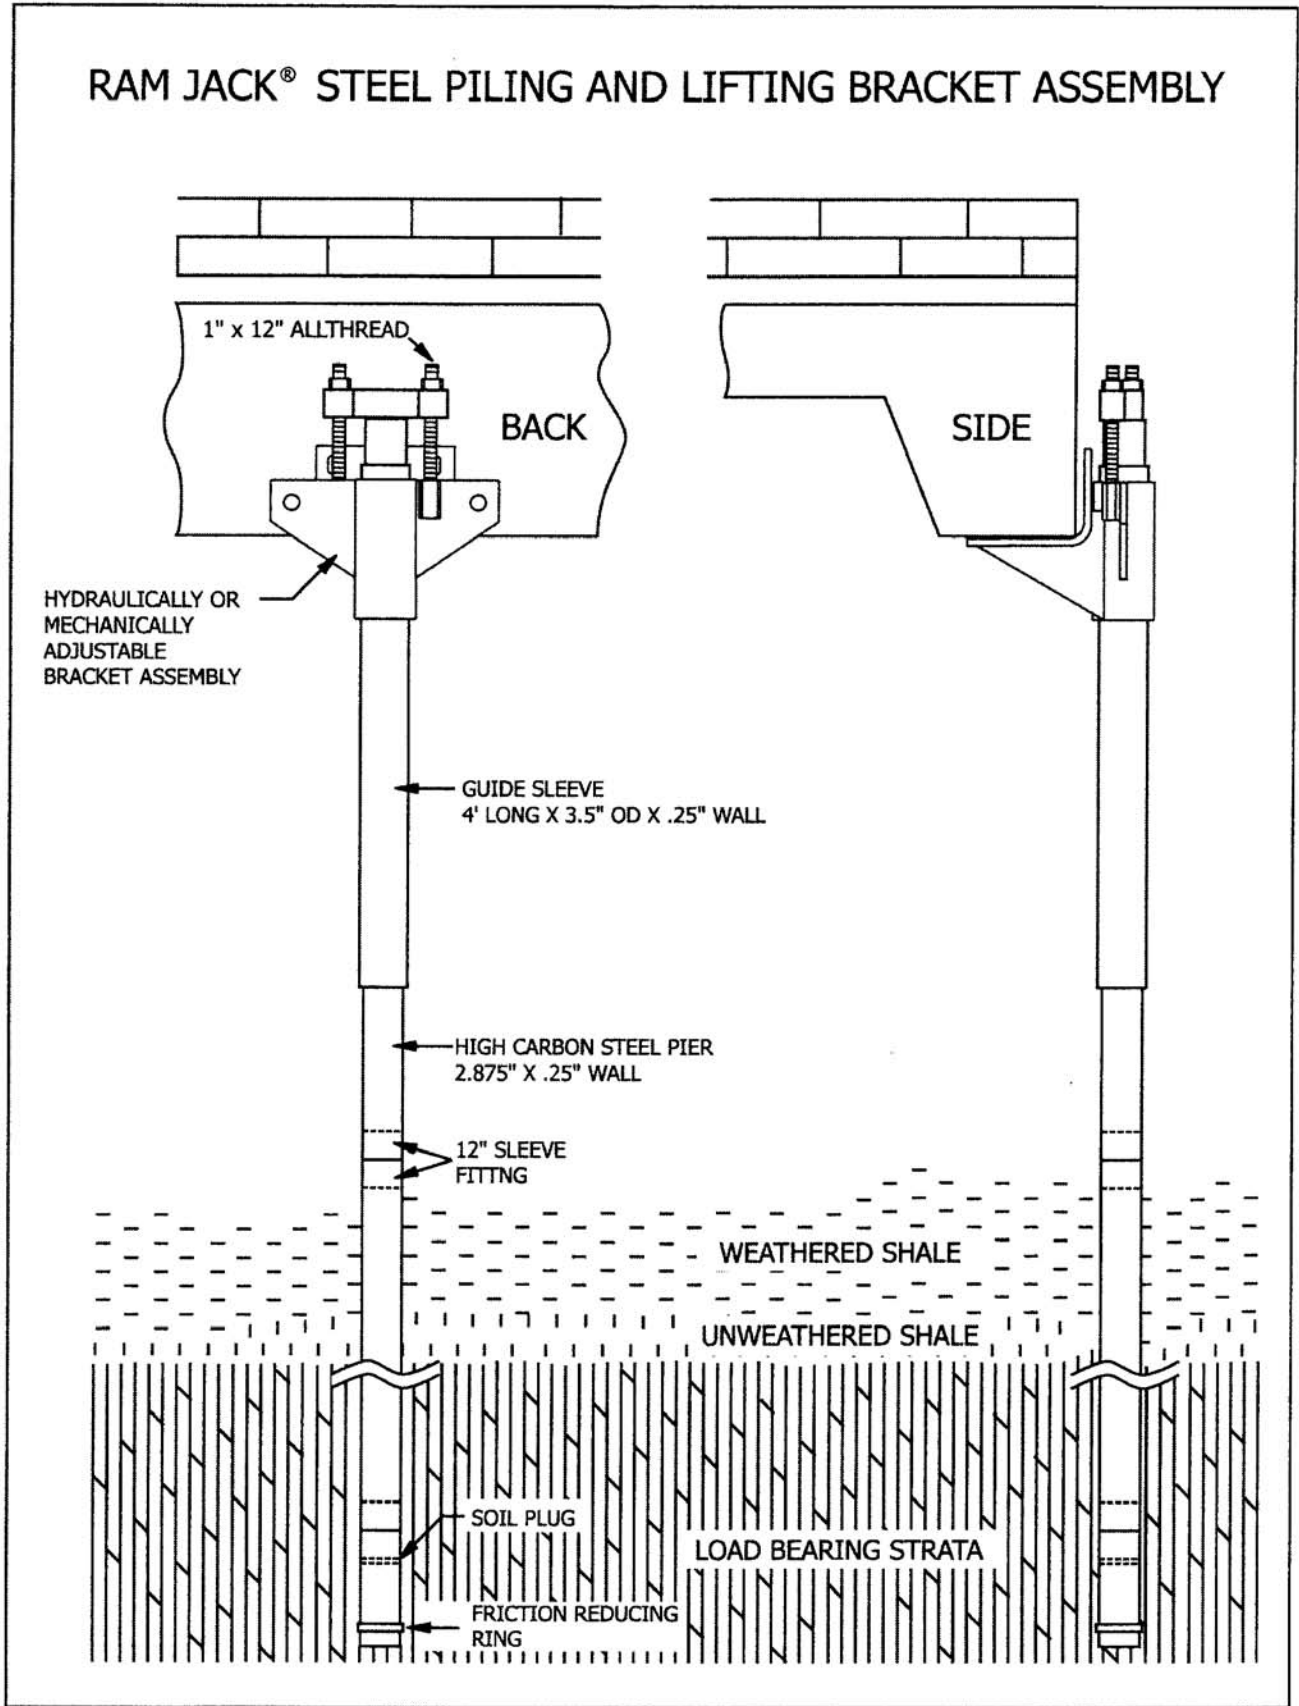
TYPICAL DRIVEN PILING USED IN CONJUNCTION WITH THE COMMERCIAL BRACKET #4021
